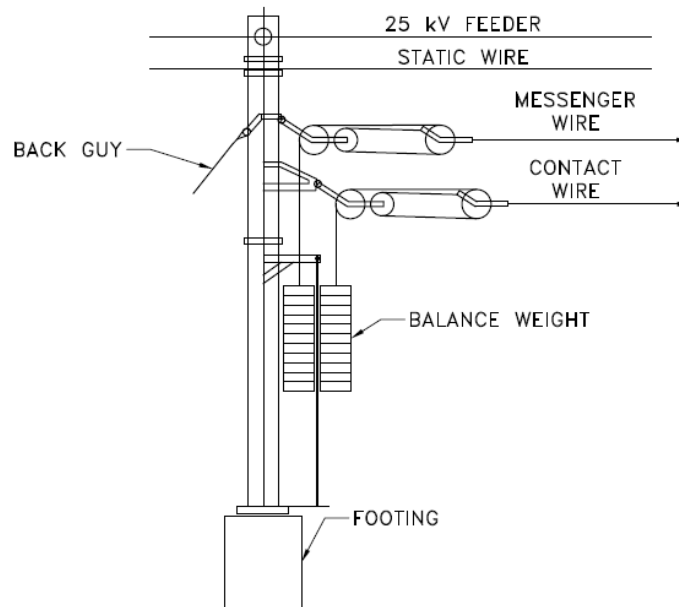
TYPICAL BALANCE WEIGHT ASSEMBLY AT DEAD ENDS
